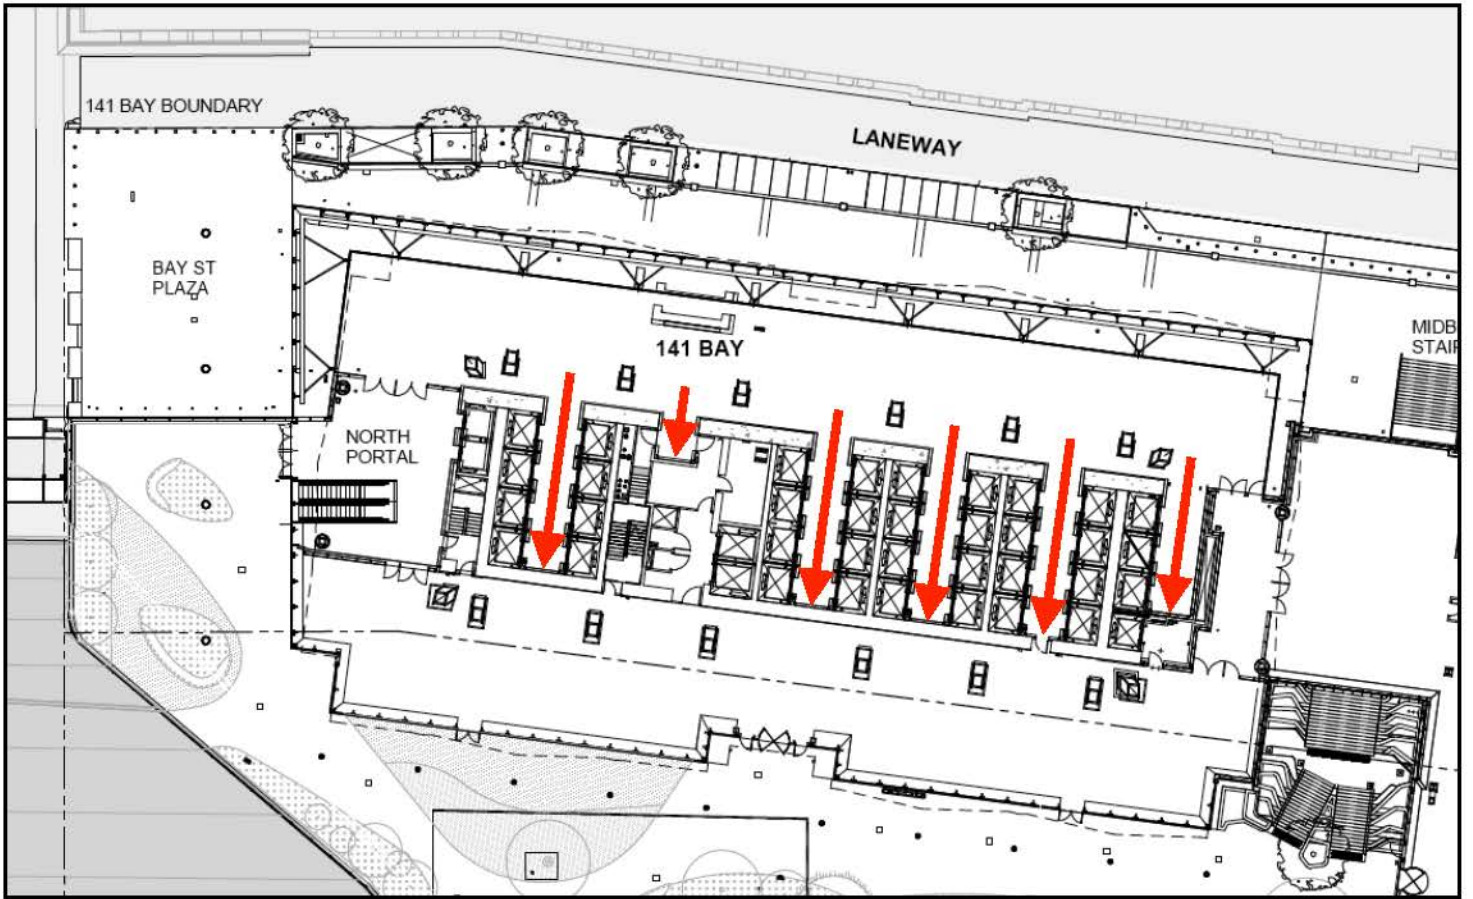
PLAN SHOWING ELEVATOR NICHE ART SITES
